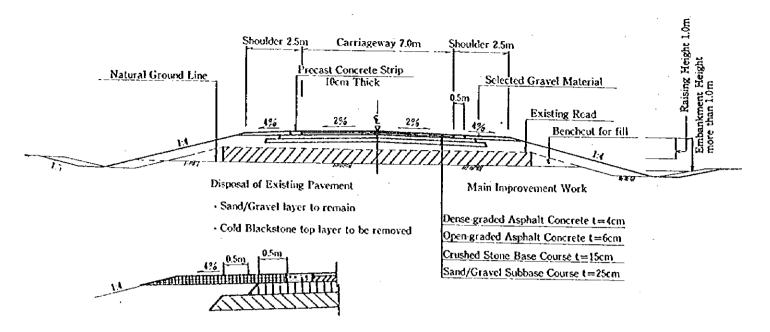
Cross-Section of Road for Type-I Improvement
